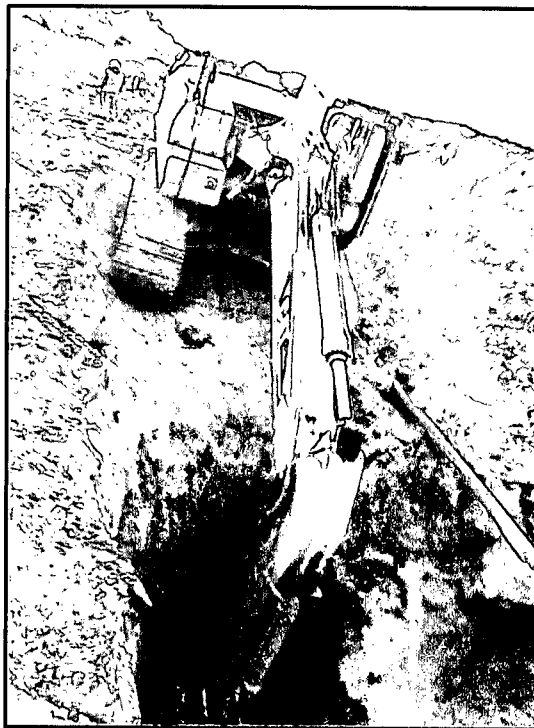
Photo of the Ludwick LS #18 pipeline excavation reaching 20' below ground surface.
